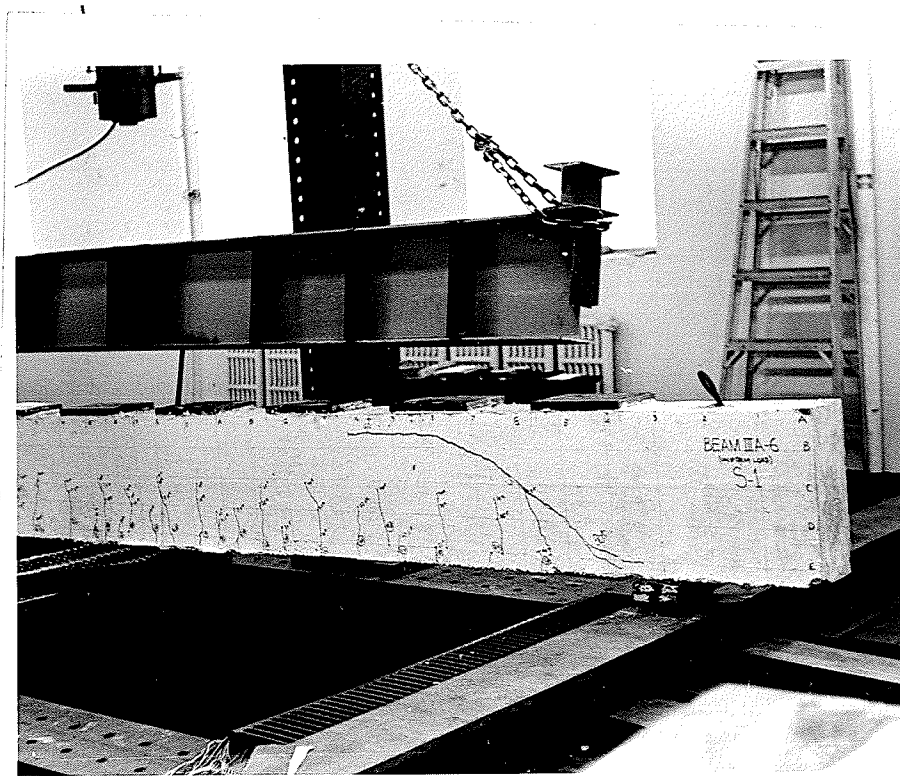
CRACKING ON END S-1 OF BEAM IIIA-6 AT FAILURE
